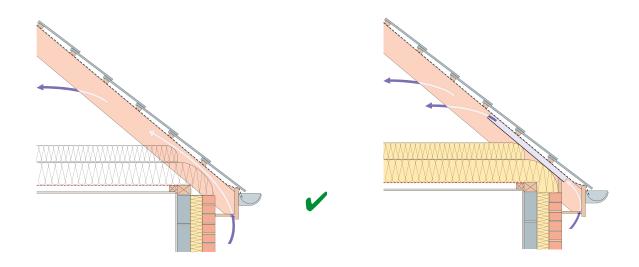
Diagram showing the importance of ventilation in roofs. To prevent condensation forming in the roof space, ventilation must be provided. A ventilation tray used at eaves level, between the insulation and the roofing membrane, ensures unrestricted air flow. Best practice requires the ventilation tray to protect the exposed face of the roof insulation with an edge board. The tray should extend 200mm above the top of the insulation to prevent wind washing. The remainder of the insulation does not require this protection as the air speed in a large ventilated volume is very low.
